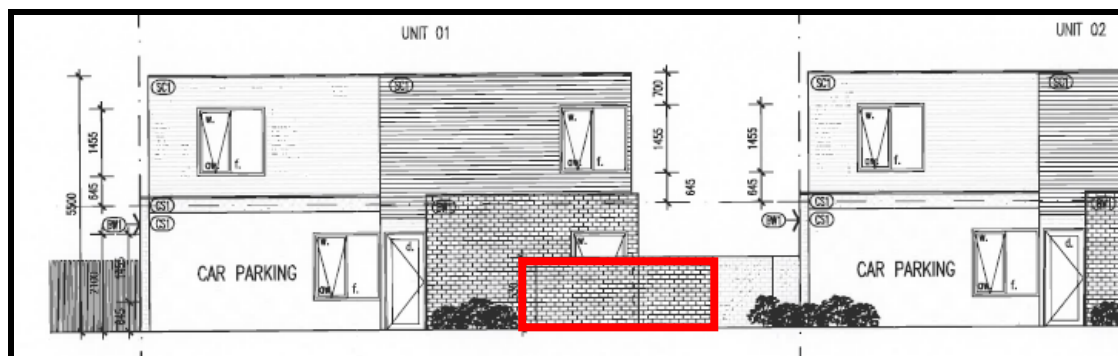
A snapshot of proposed dwelling 1 and proposed dwelling 2 showing the masonry wall separating the window of a habitable room from the shared driveway.
